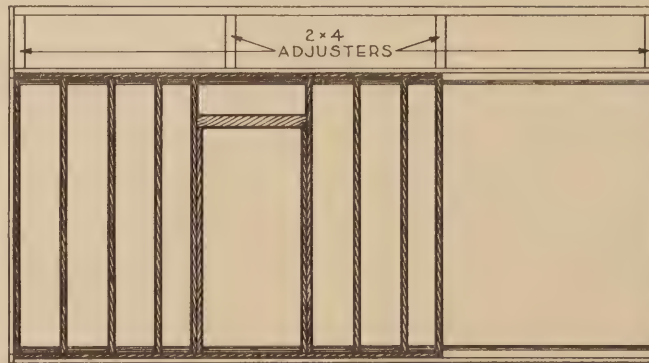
PLACE ADJUSTERS, THUS SQUARING SECTION, AND TRUE STUDS AND FRAMING FOR OPENING. NAIL TOP AND BOTTOM PLATES TO STUDS AND FRAMING FOR OPENING.
